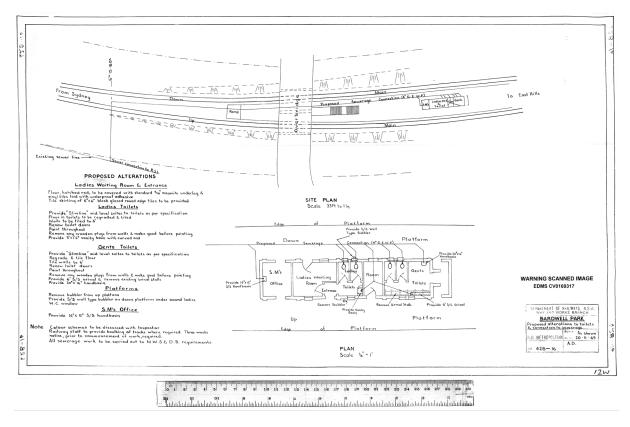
Alterations to station platform building, 1968 (Virtual Plan Room).
